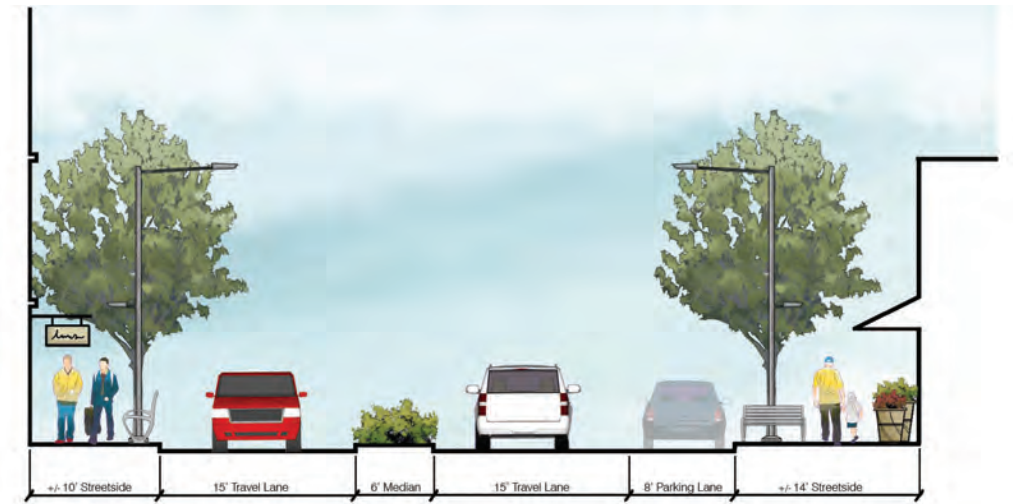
Flores Street Proposed Cross-Section, Old Guilbeau to Stumberg
